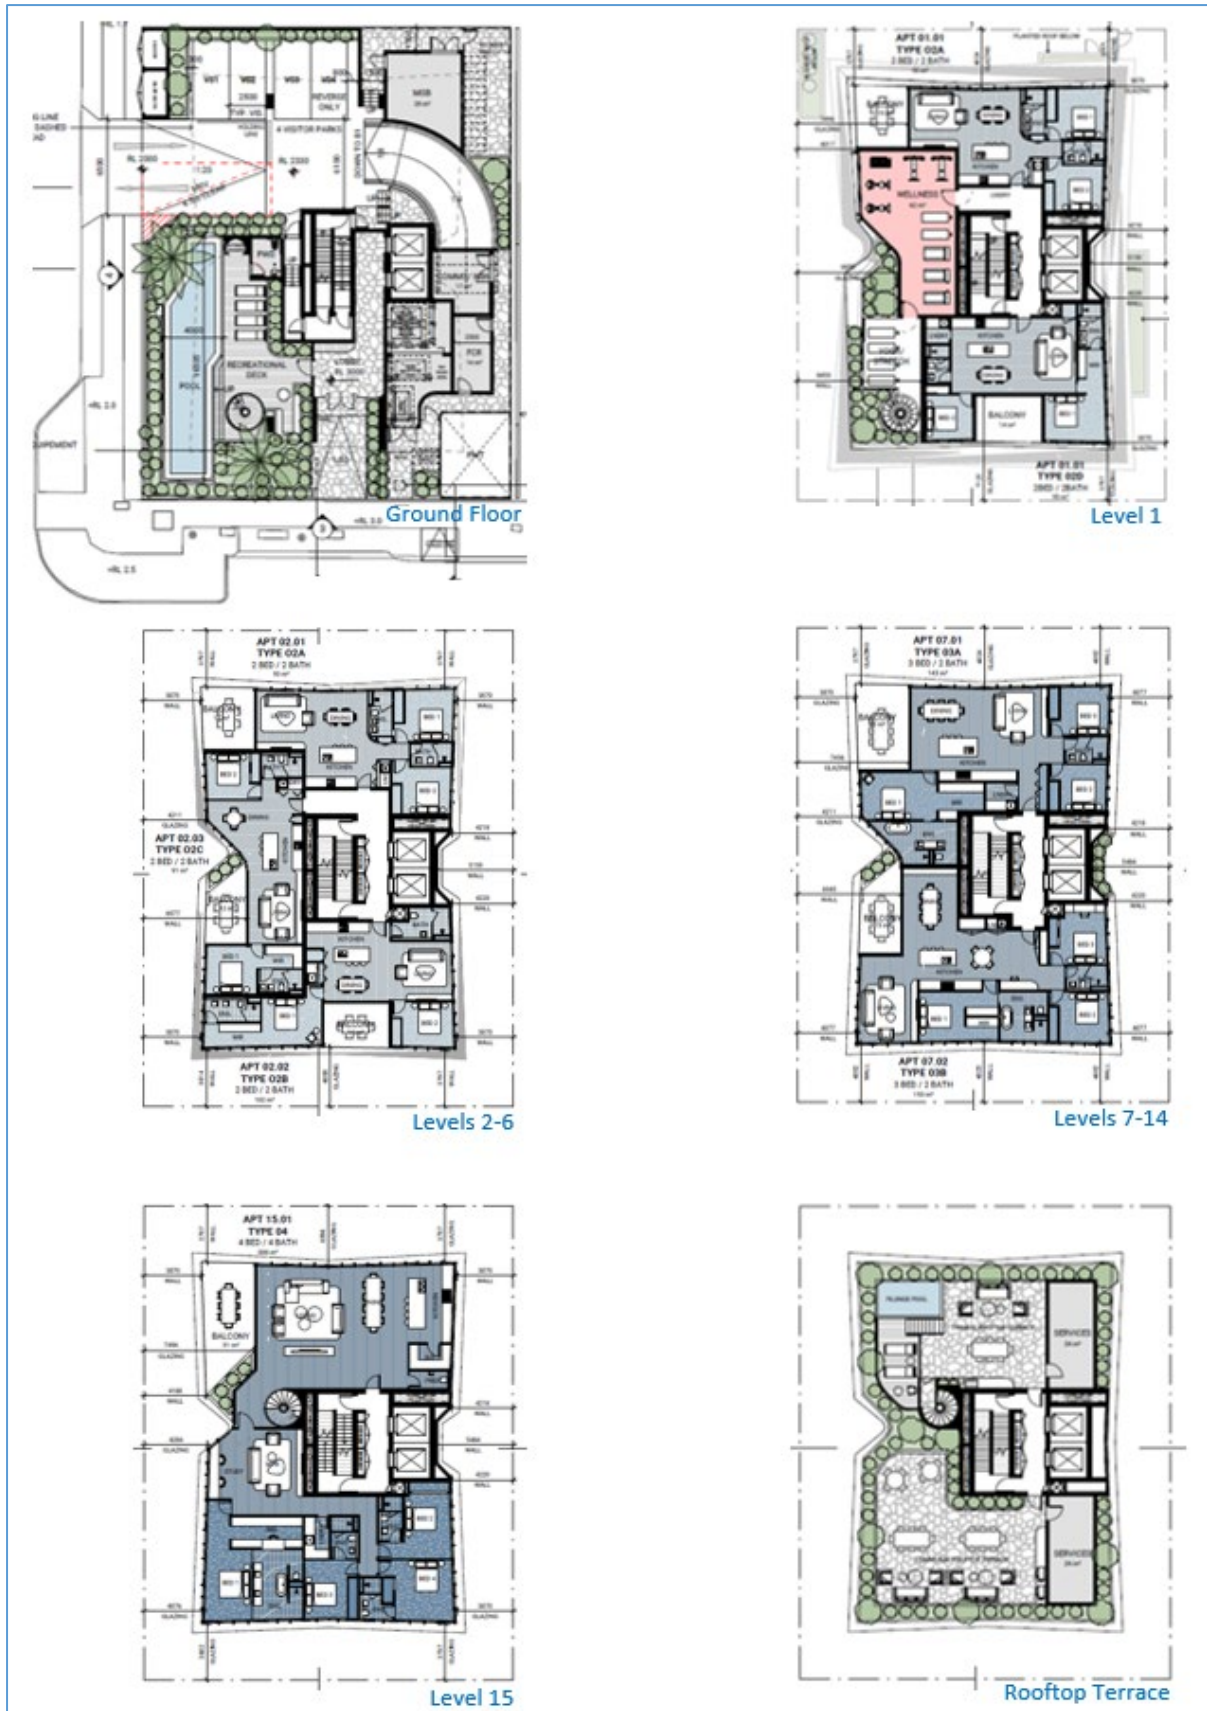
Floor Plans – Ground to Rooftop (Source: Plus Architecture)
